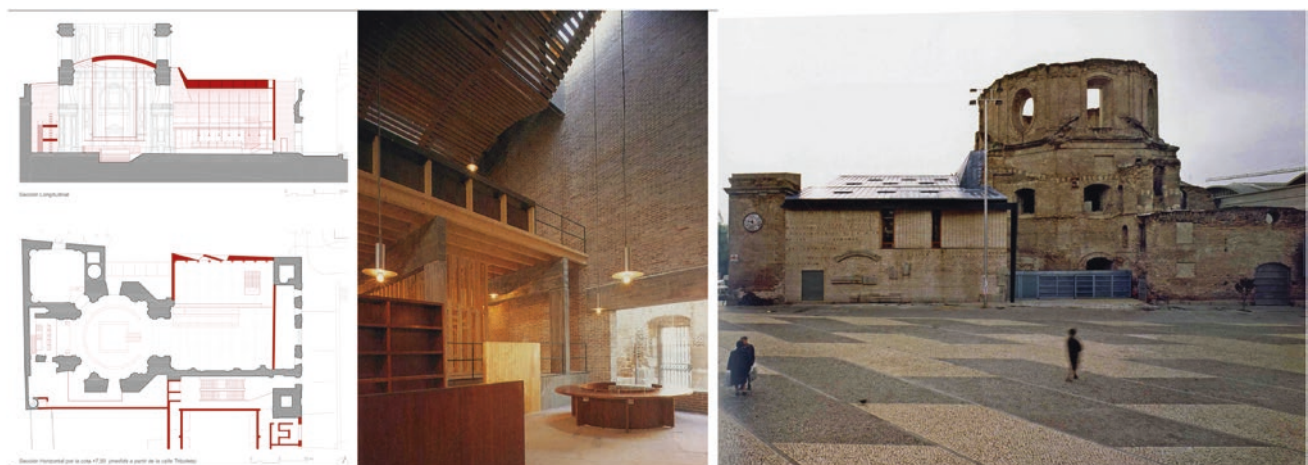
Plan and section of the building; author's own, 2013. Interior and exterior view; Linazasoro (2004)
